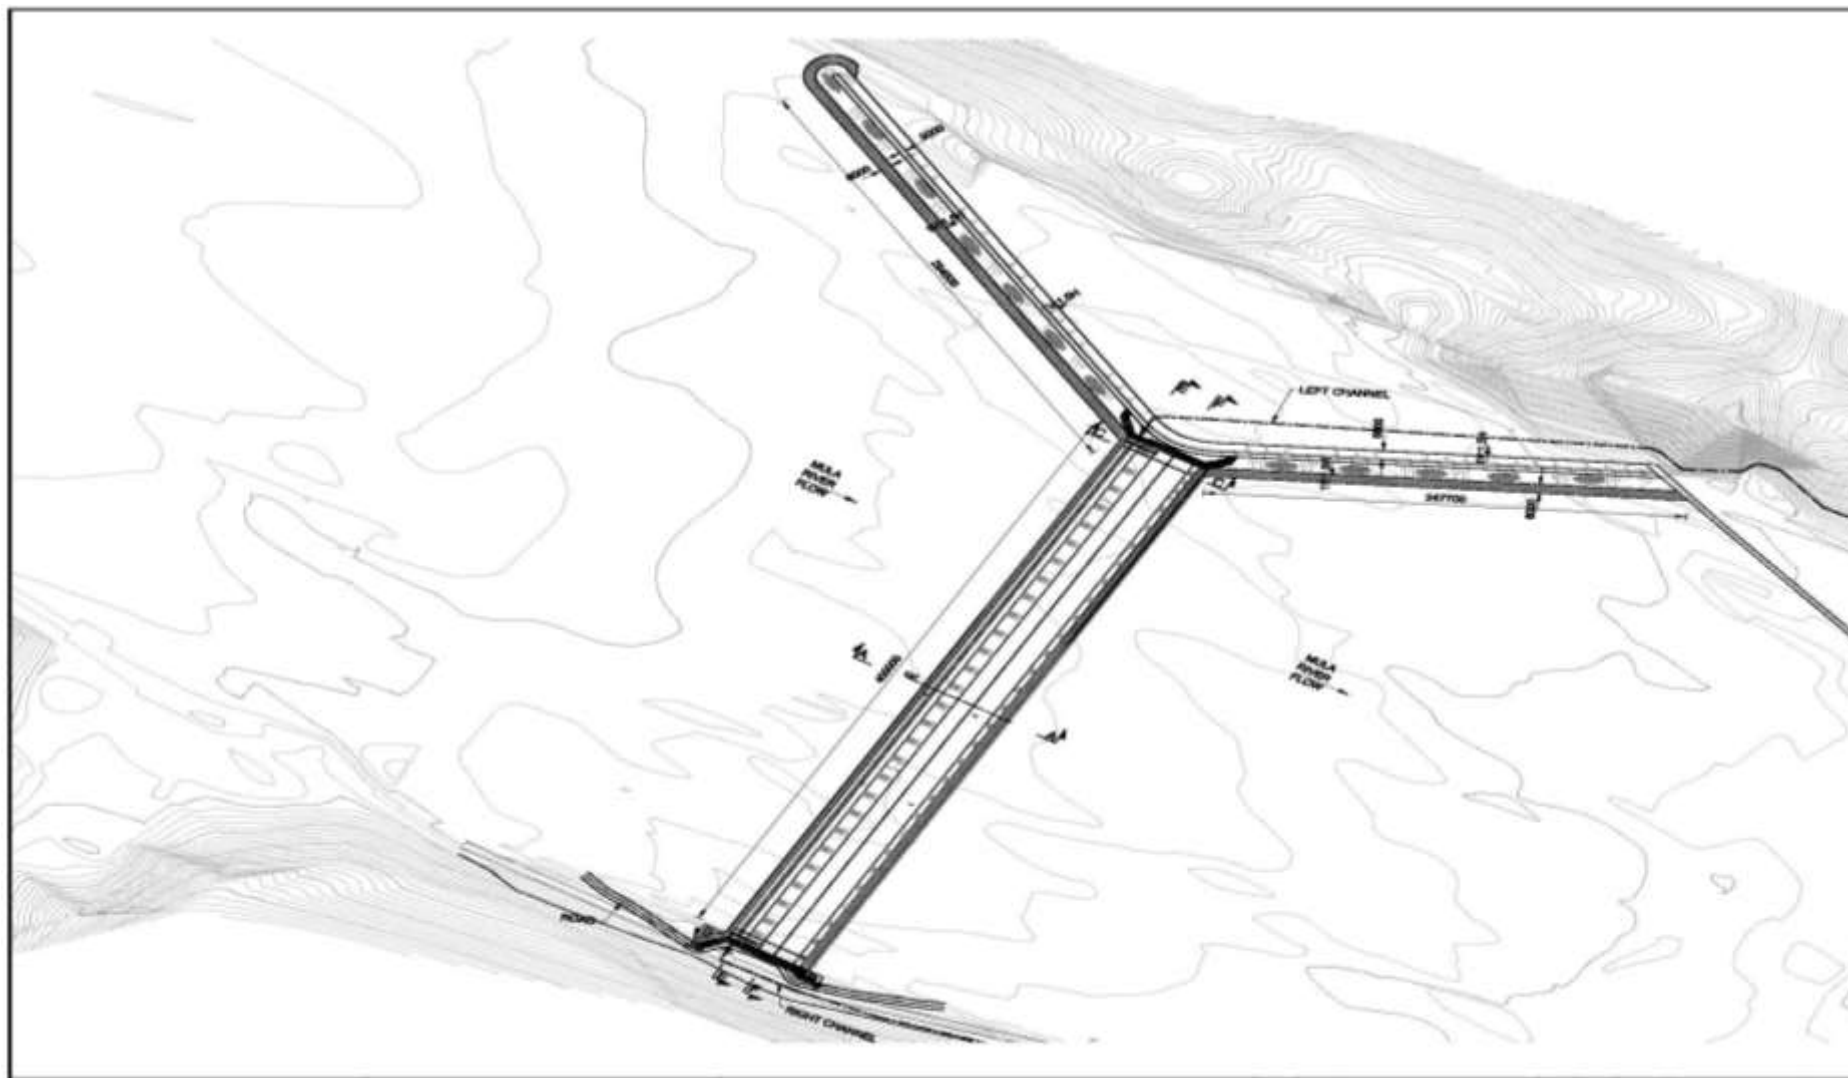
General Layout Plan of Manyalo Riko & Rind Ali Weir
